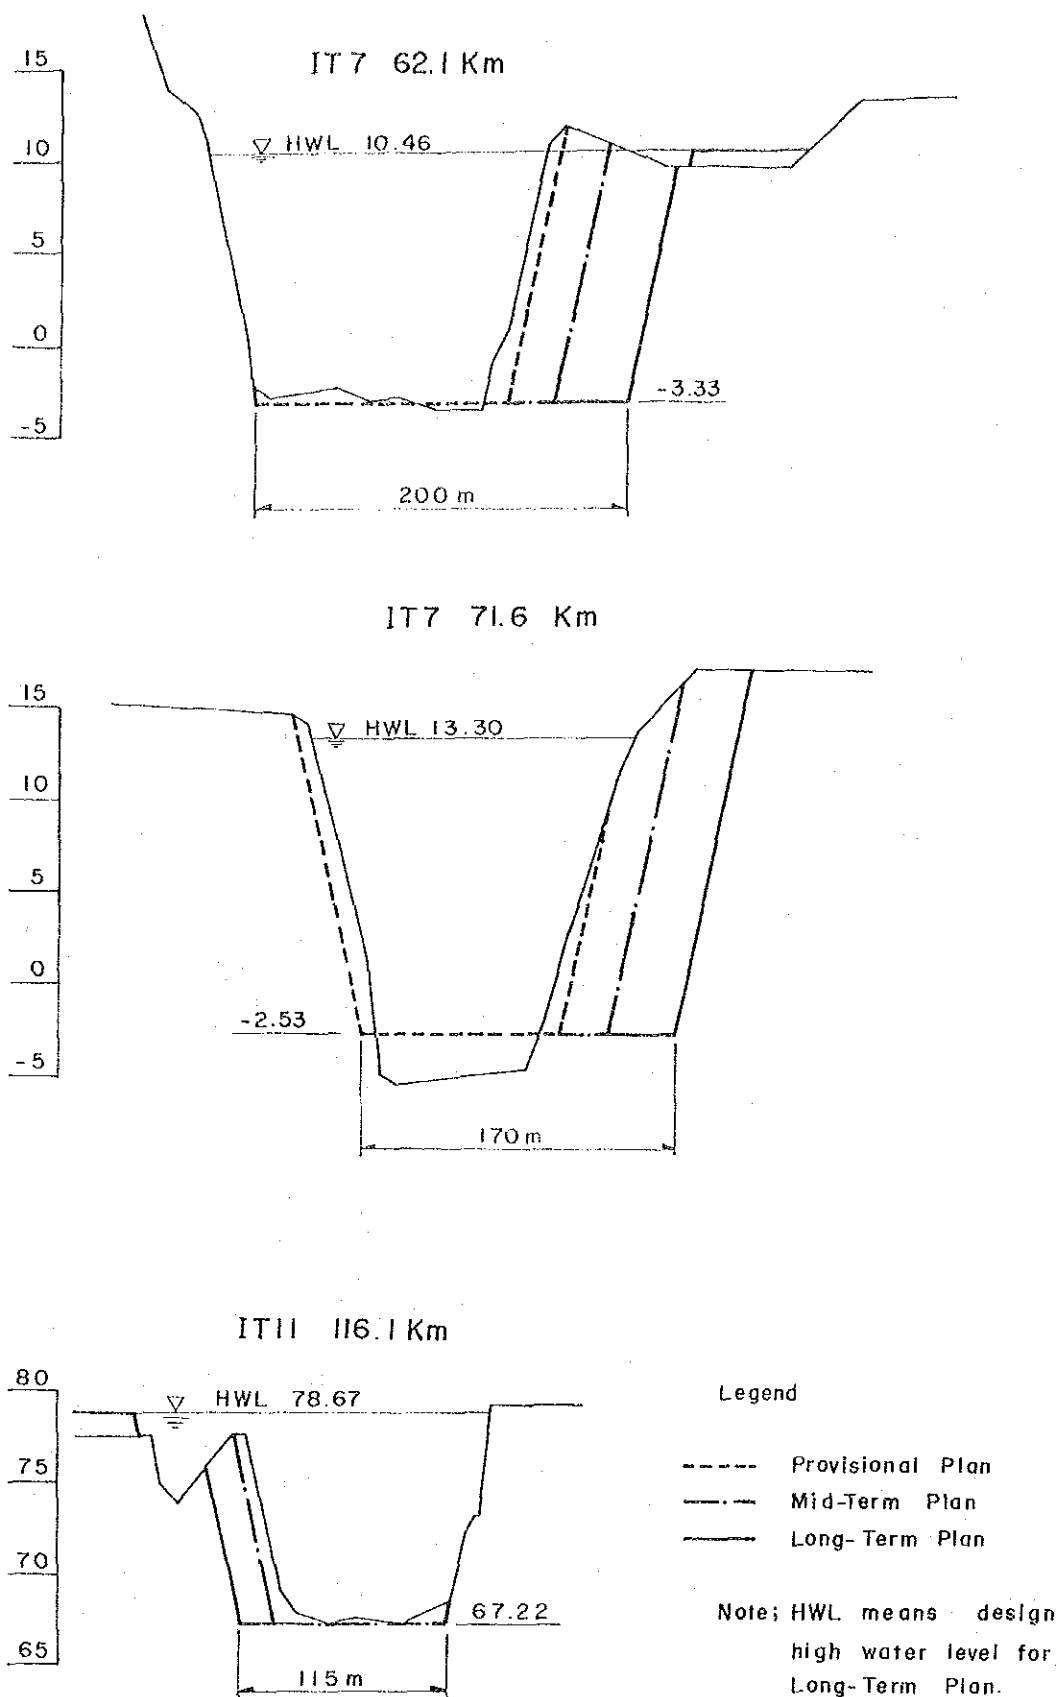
TYPICAL CROSS SECTION (3/4)
